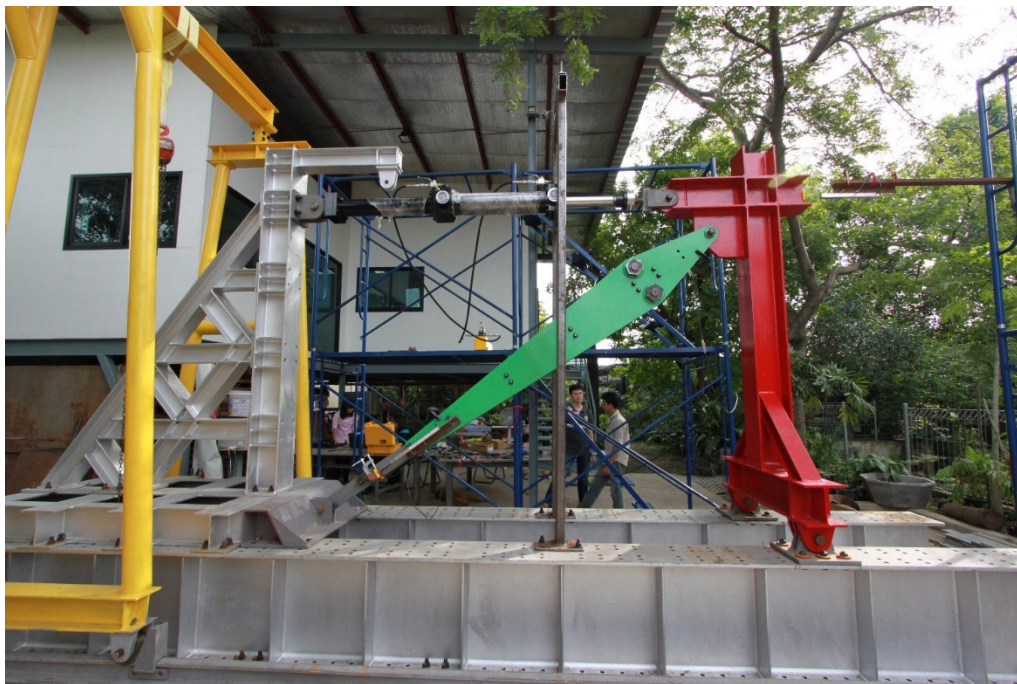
Picture of the experiment setup of the steel-frame sub-assembly equipped with the CFD brace system
